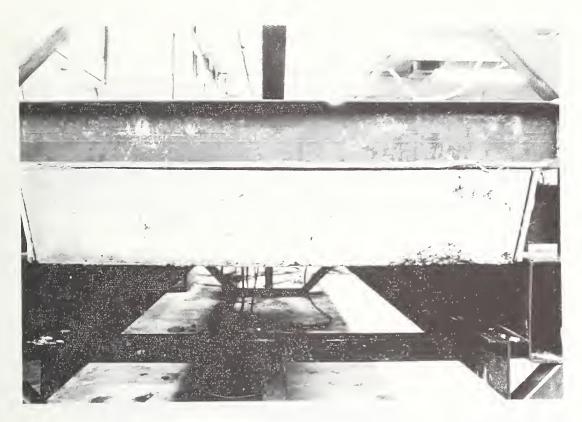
SLIPFORMED SLAB SLUFFED FROM TEST BED SURFACE
